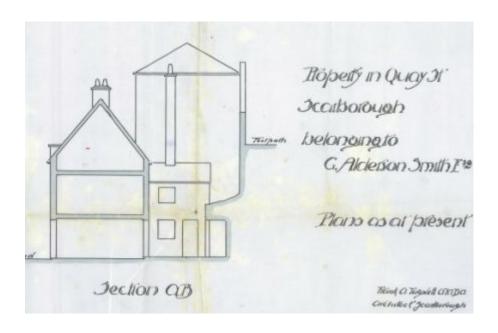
Extract from the Building byelaw drawing showing the earlier cottage in cross section
